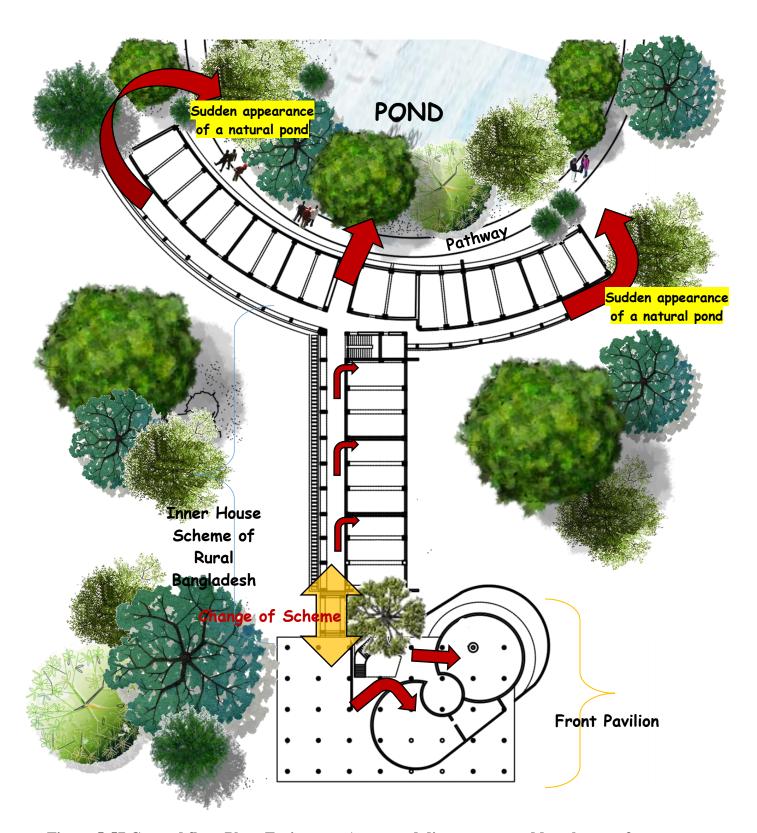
Ground floor Plan: Enticement (turns and disappear; a sudden change of views). The "Bagan Bari" (house in a garden) scheme creates enticement.
